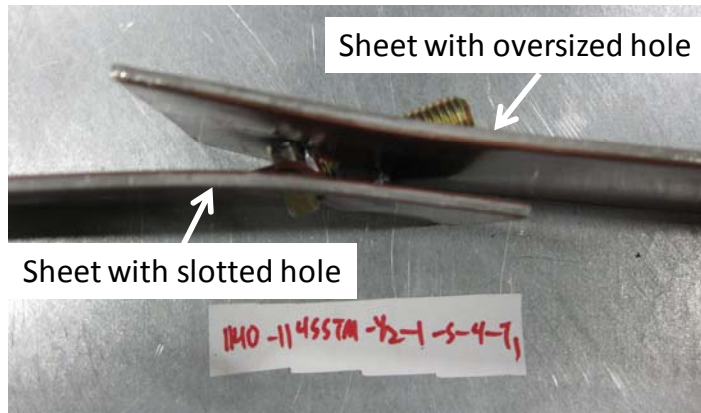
Bearing Failure of Test Specimen 1140-114SSTM-1/2-1-S-4-T1
